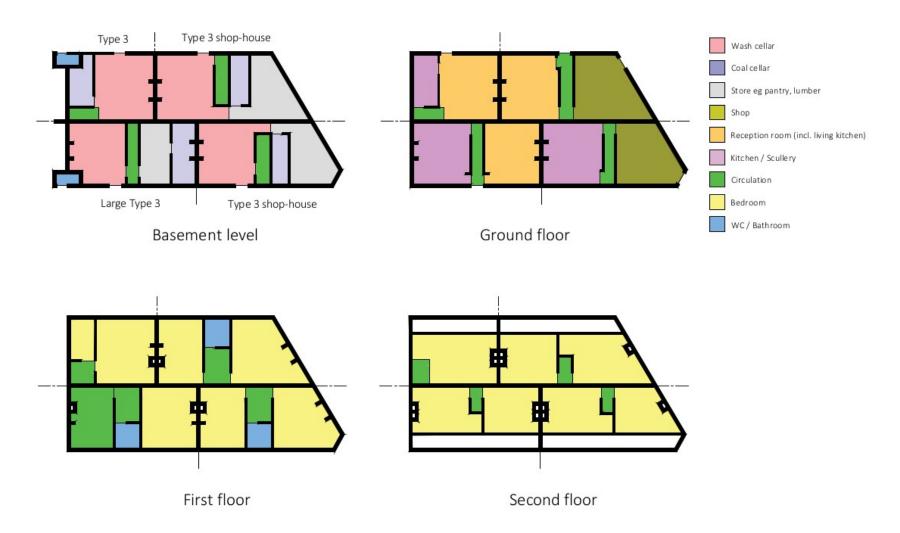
Type 3 houses and shop-houses at the end of a street (Redrawn from original plans by Thackray 1899a).
